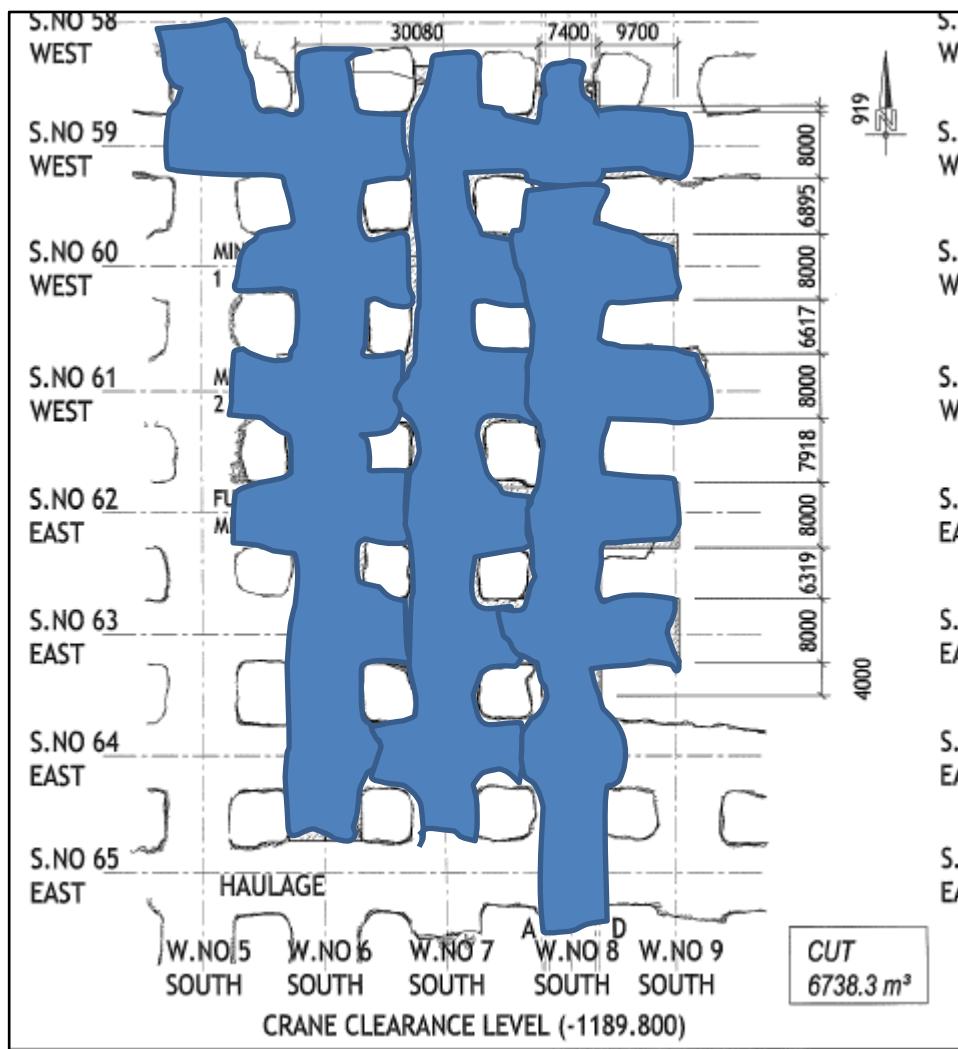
Plan indicating hangingwall that must be supported with both primary (resin bolts) and secondary support.
